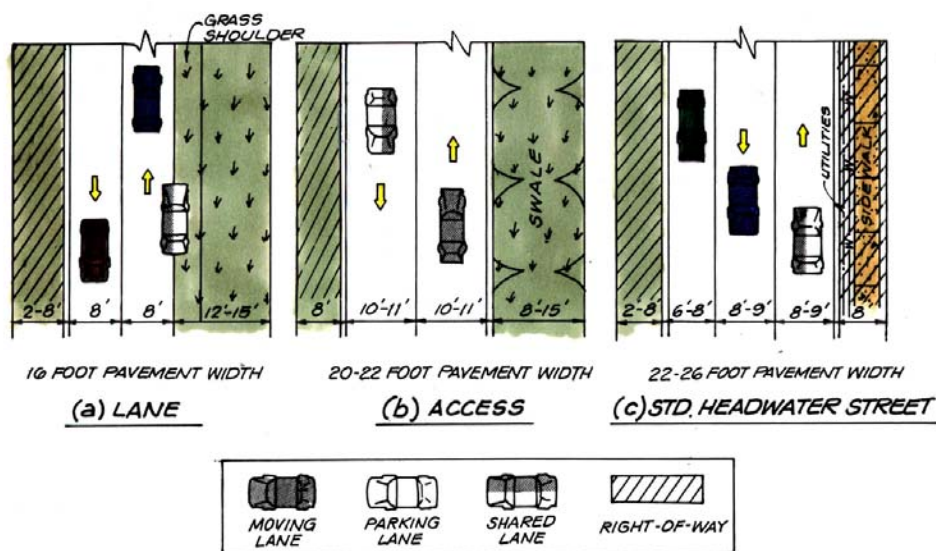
Potential Design Options for Narrower Street and Roadway Widths
